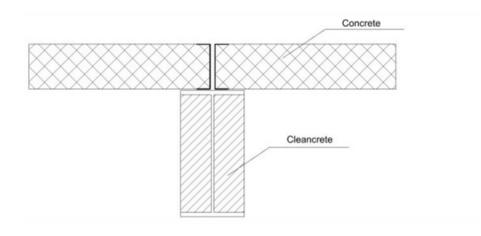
THE PROPOSED CONSTRUCTION SYSTEM OF CONCRETE SLAB AND STEEL BEAMS, WITH DETACHABLE CONNECTIONS AND CLEANCRETE© INSTEAD OF THE FIRE COATING. ©ZHAW
